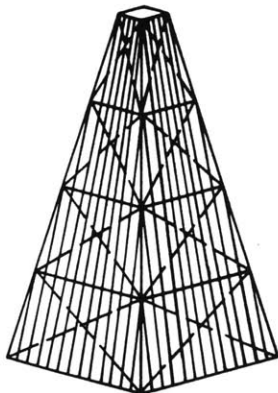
Trussed tubular frame with sloping exterior columns
